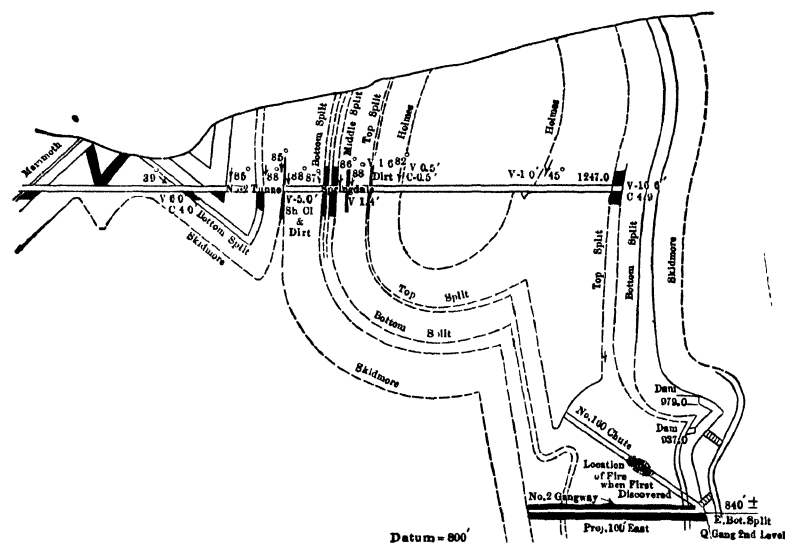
SECTION THROUGH BREAST NO. 160 OF MAMMOTH VEIN, EAST SIDE, SECOND LEVEL, RAHN COLLIERY.
